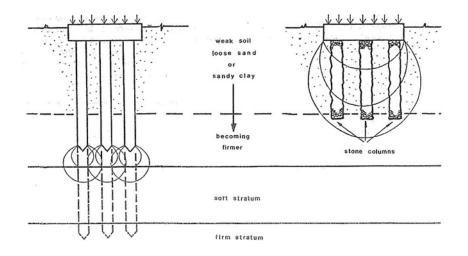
Comparison of deep foundations (piling) and ground improvement (stone columns) (Glover 1985)
